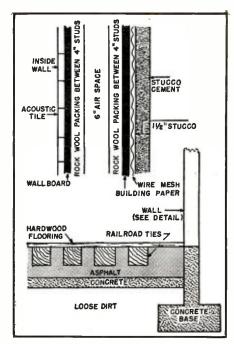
Cross section of the construction used for the walls and floor of the Republic Production, Inc.'s scoring stage.
